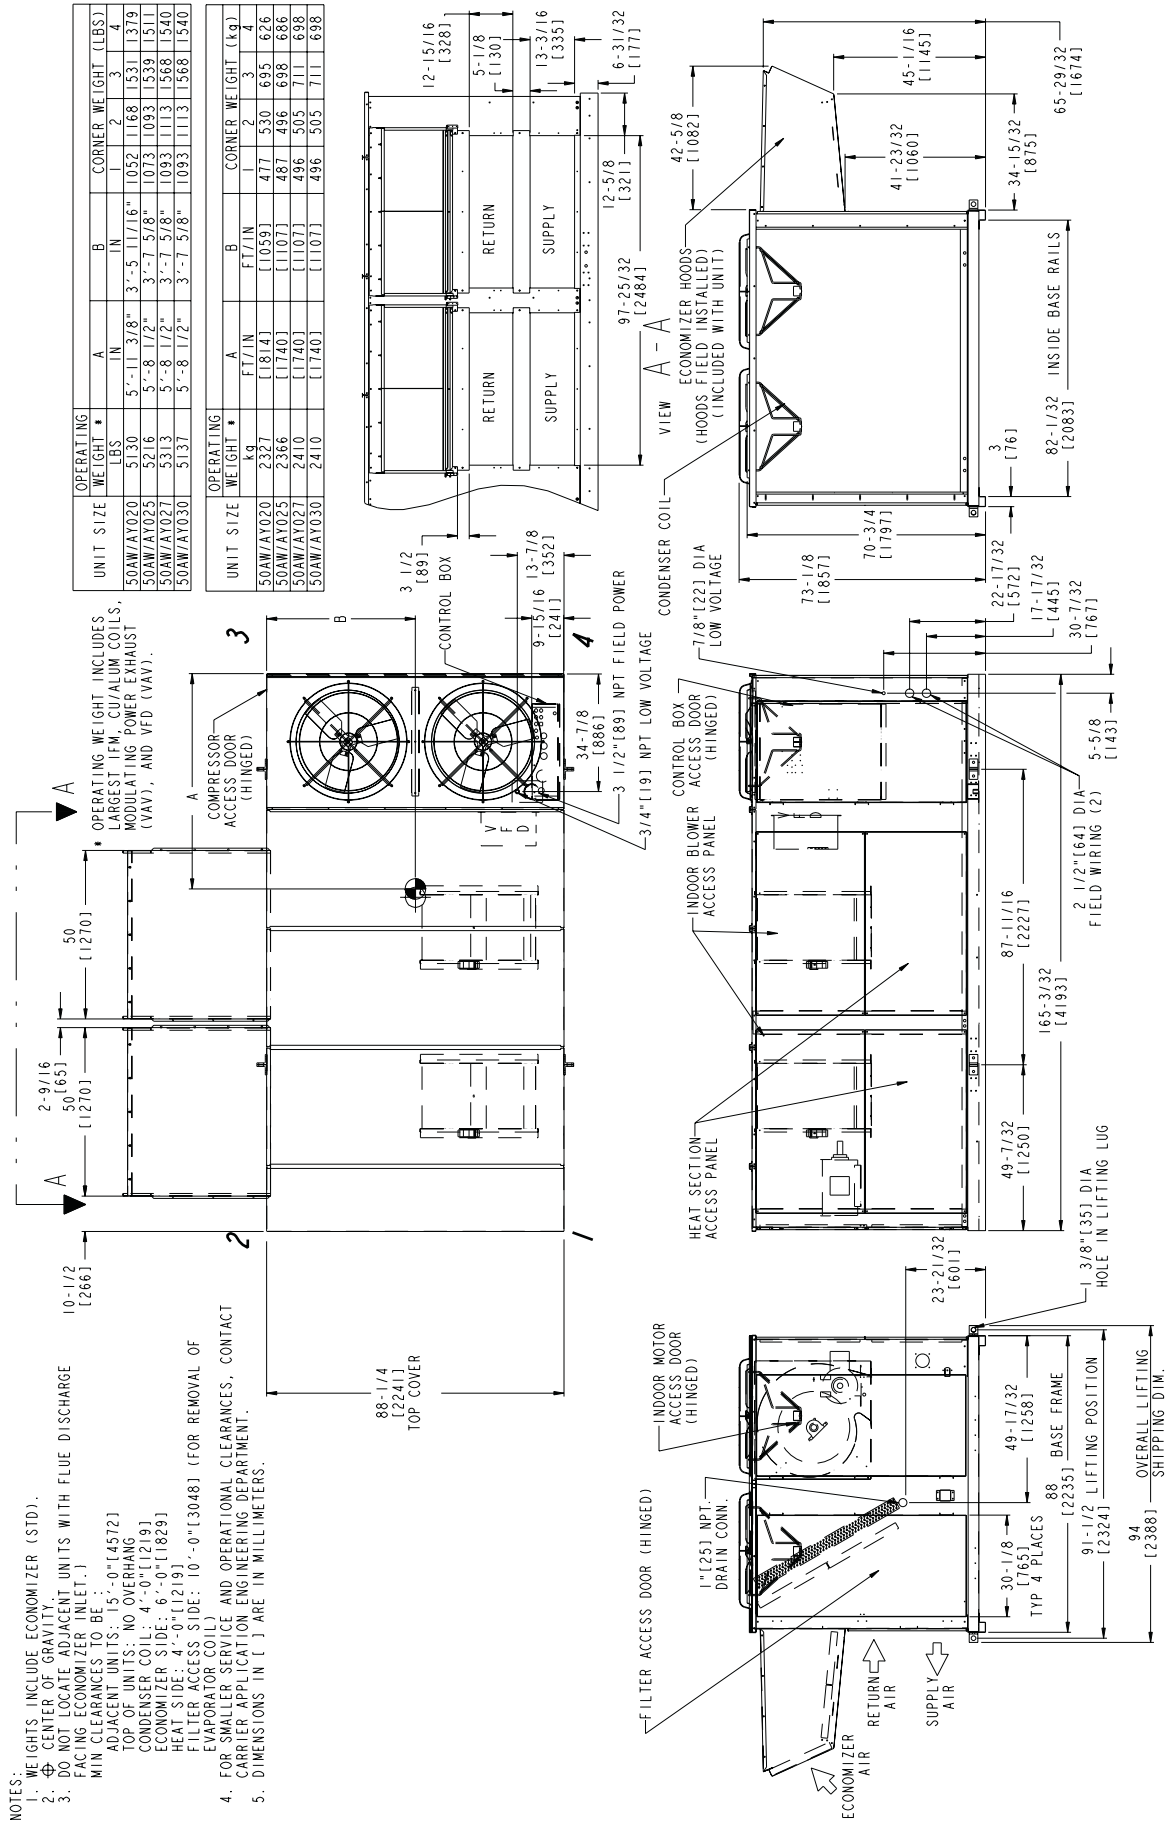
Base Unit Dimensions — 50AJ, AK035-050
